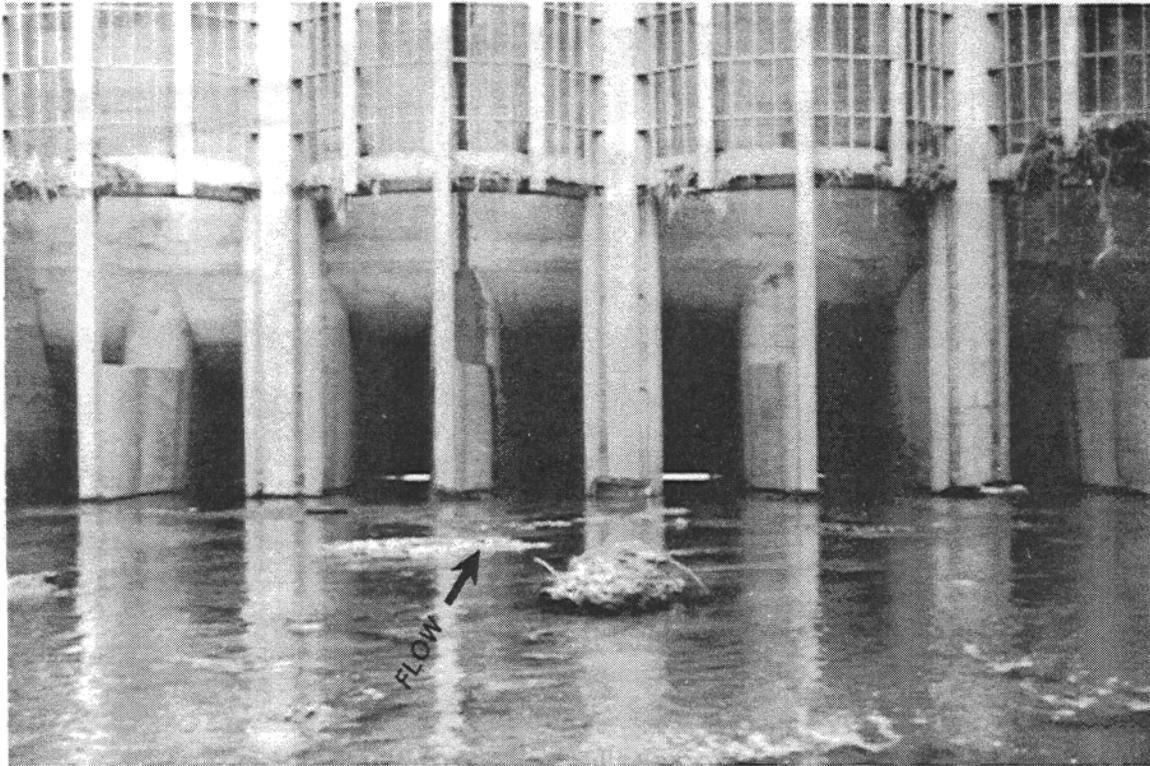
Approach to Outlet Works (gates partially open)
